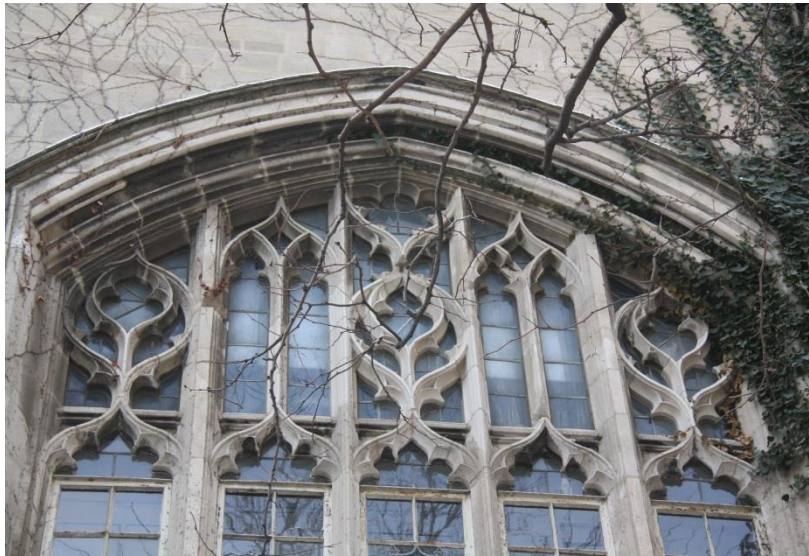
Cracked and spalled window mullions and rosettes
